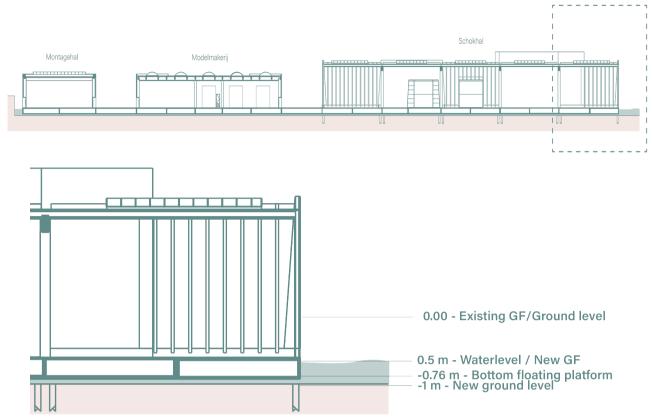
Section and fragmented section of floating Schokbeton (Made by author, 2024)
